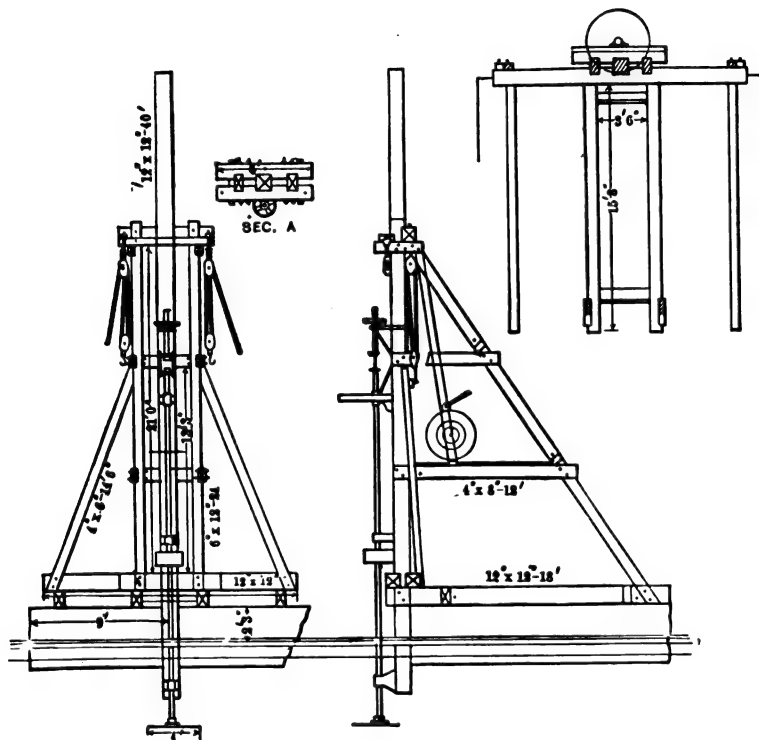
MACHINE FOR SAWING OFF PILES UNDER WATER.
